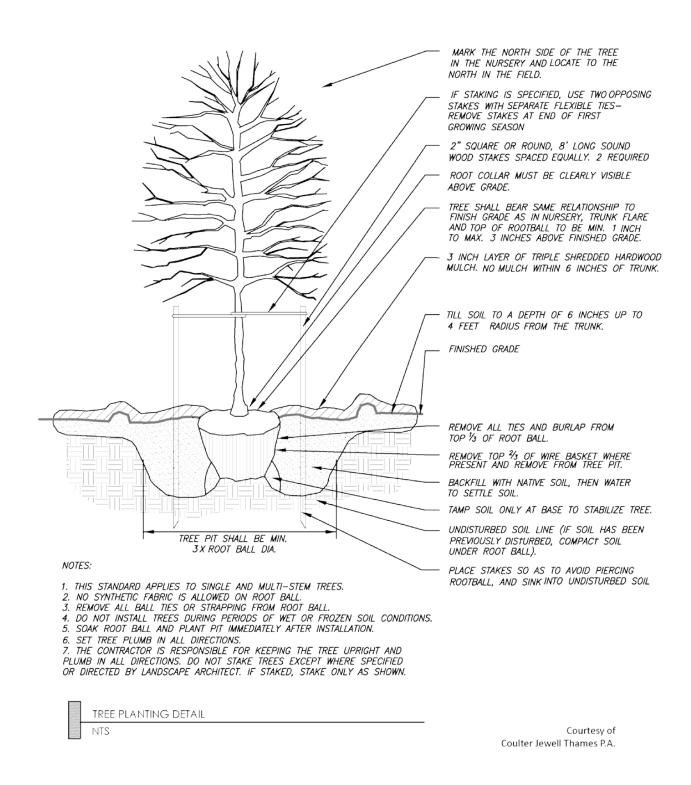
Recommended Tree Planting Within Right-of-Way Detail
